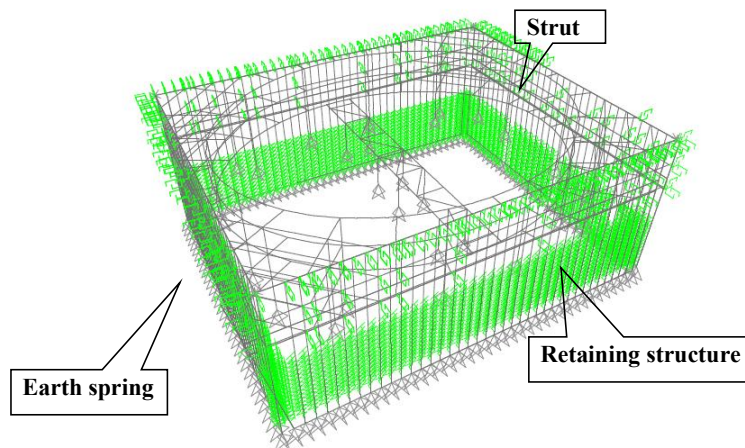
Building Information Model Of Pile-Strut Bracing Structure Of The Excavation
